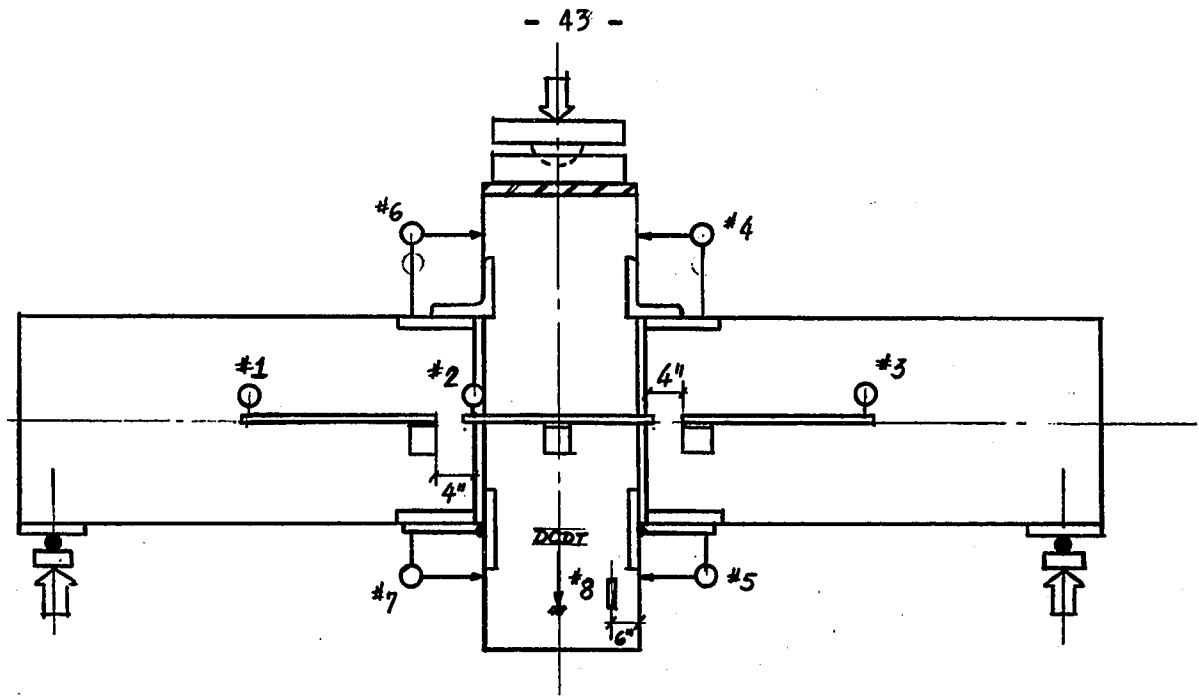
BEAM-TO-COLUMN CONNECTION.
